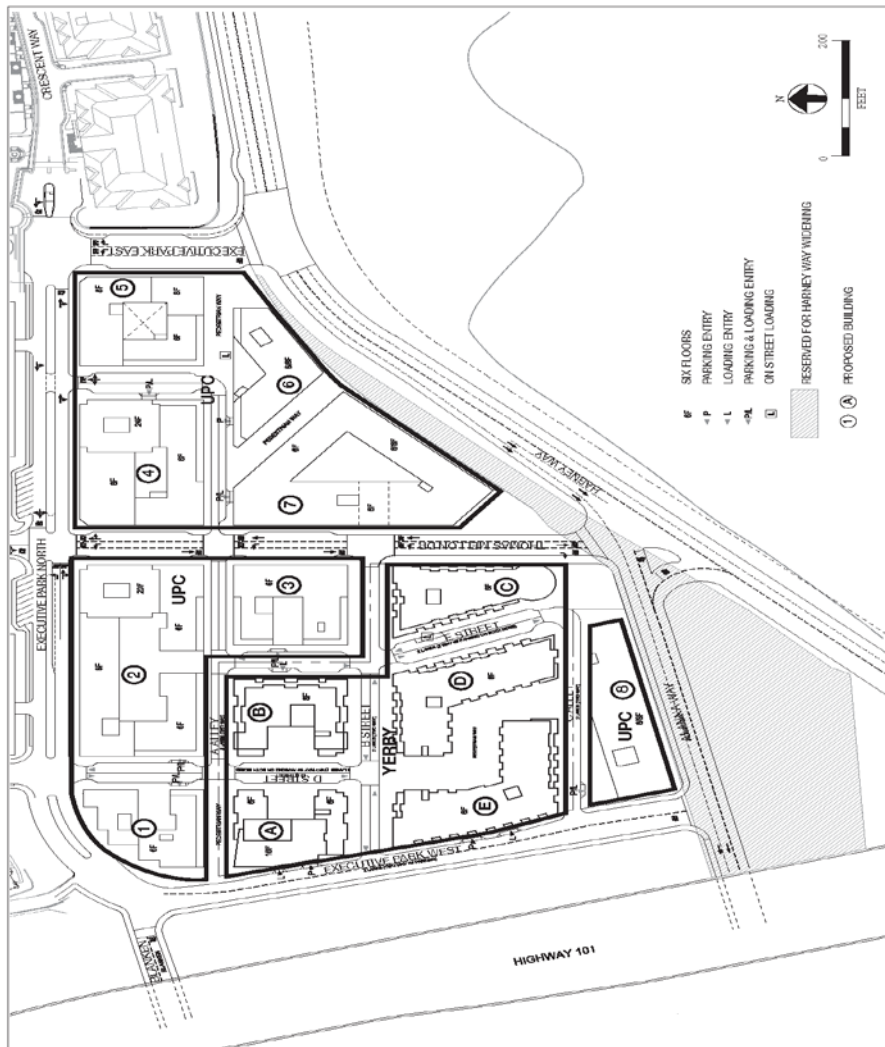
PROPOSED YERBY AND UPC DEVELOPMENT PROJECTS - COMBINED SITE PLAN
